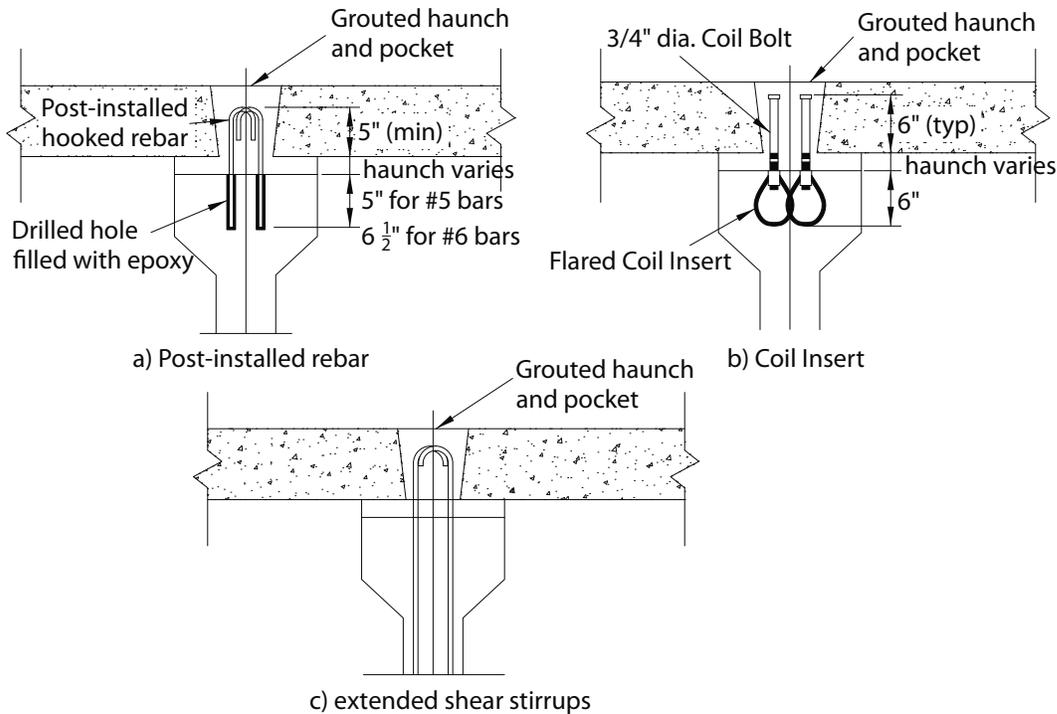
Details for horizontal shear connectors on precast girders (CLR-W).
